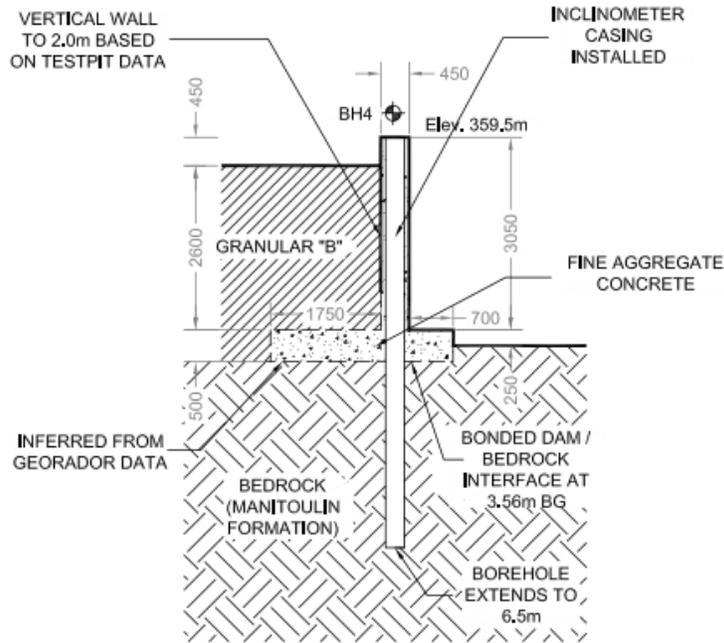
Typical Cross Section of the Retaining Wall (Extracted from Terraprobe, 2013)
